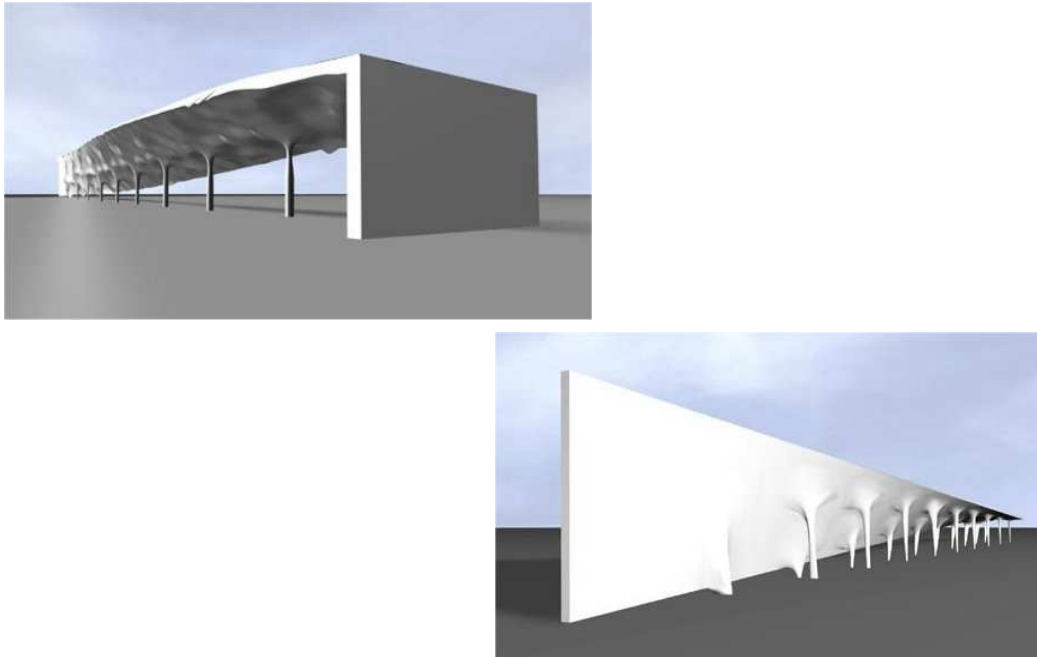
Examples of future concrete structures [Svend Röttig, A].
